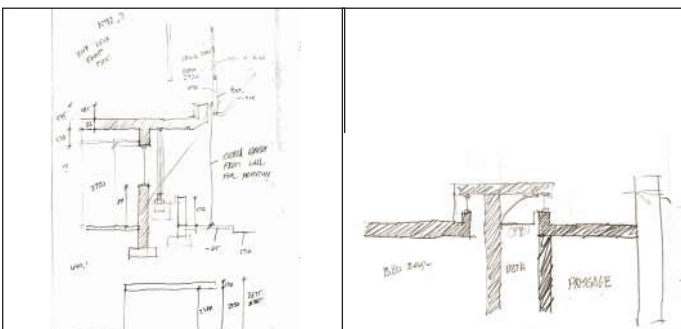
Entrance facade detailing and accommodation light detailing (Author: 2019)
